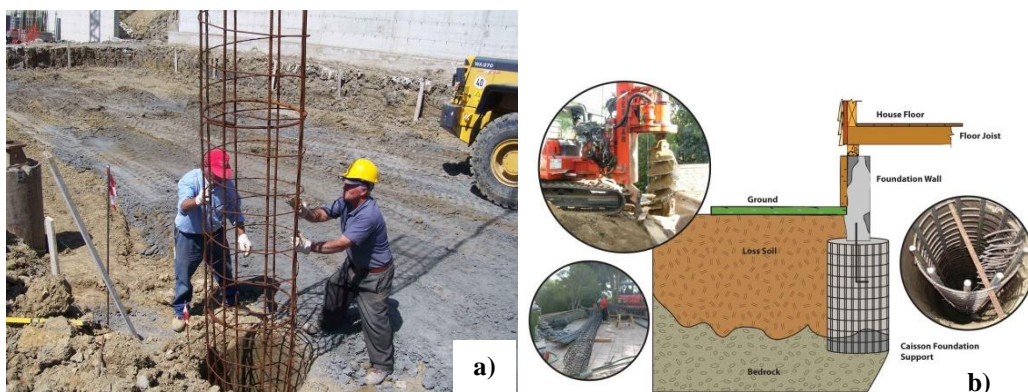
Example of deep foundation: a) Pile; b) Caissons
